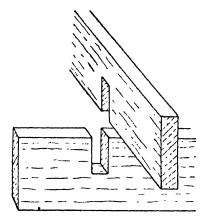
Halved Joint with Thin and Deep Pieces crossing.
